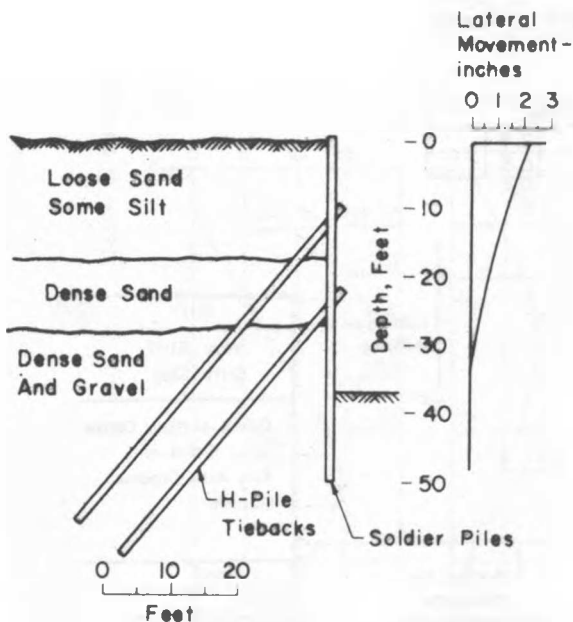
Section through Cut in Sand Supported by Tieback System; Lateral Movement of Soldier-Pile Wall during Excavation
